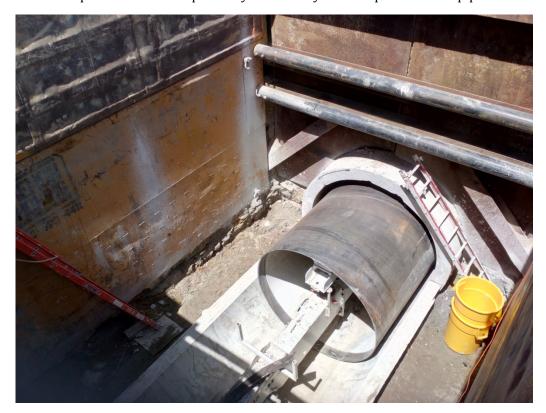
Steel Sliplining with Non-Collapsed Pipe in Progress
